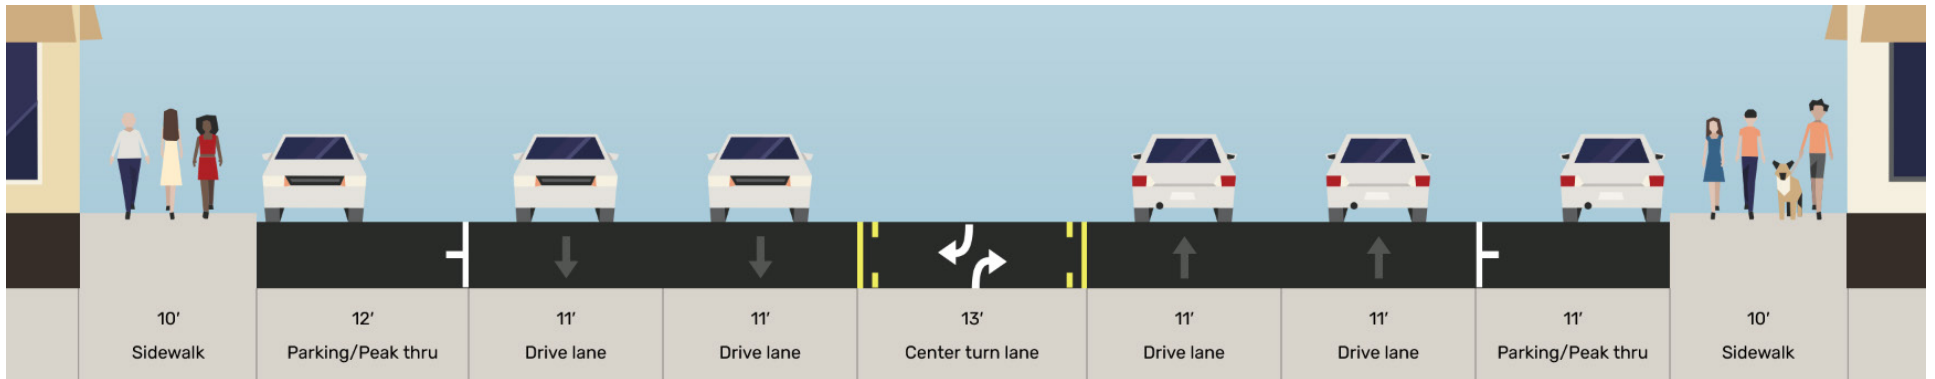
Existing cross-section: Rosecrans Ave from Prairie Ave to Crenshaw Blvd
